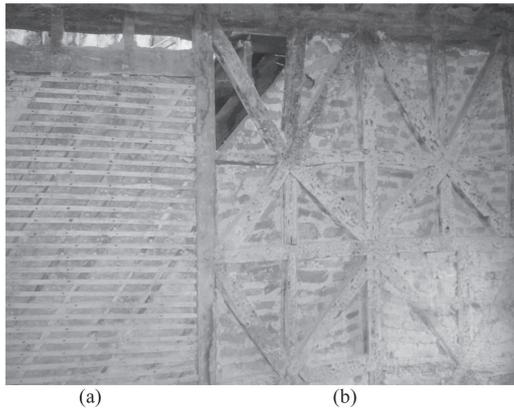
Examples of Portuguese traditional timber walls. (a) Tabique walls and (b) Frontal walls.
